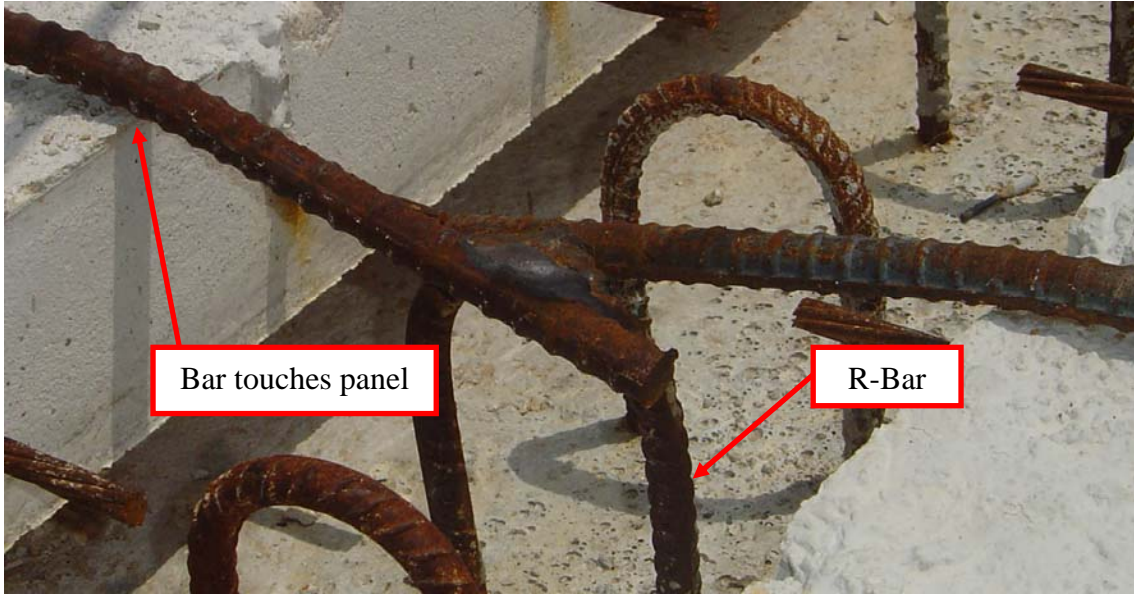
Weld of Top Bracing Bar to R-Bar of Girder
